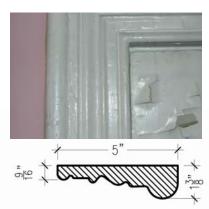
Door 204 case molding type-6 photo and profile. (Photo: BBB, 2006)
